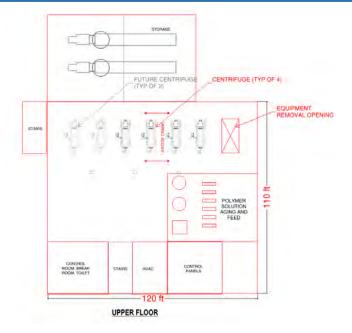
Dewatering Centrifuge Upper Floor Layout
